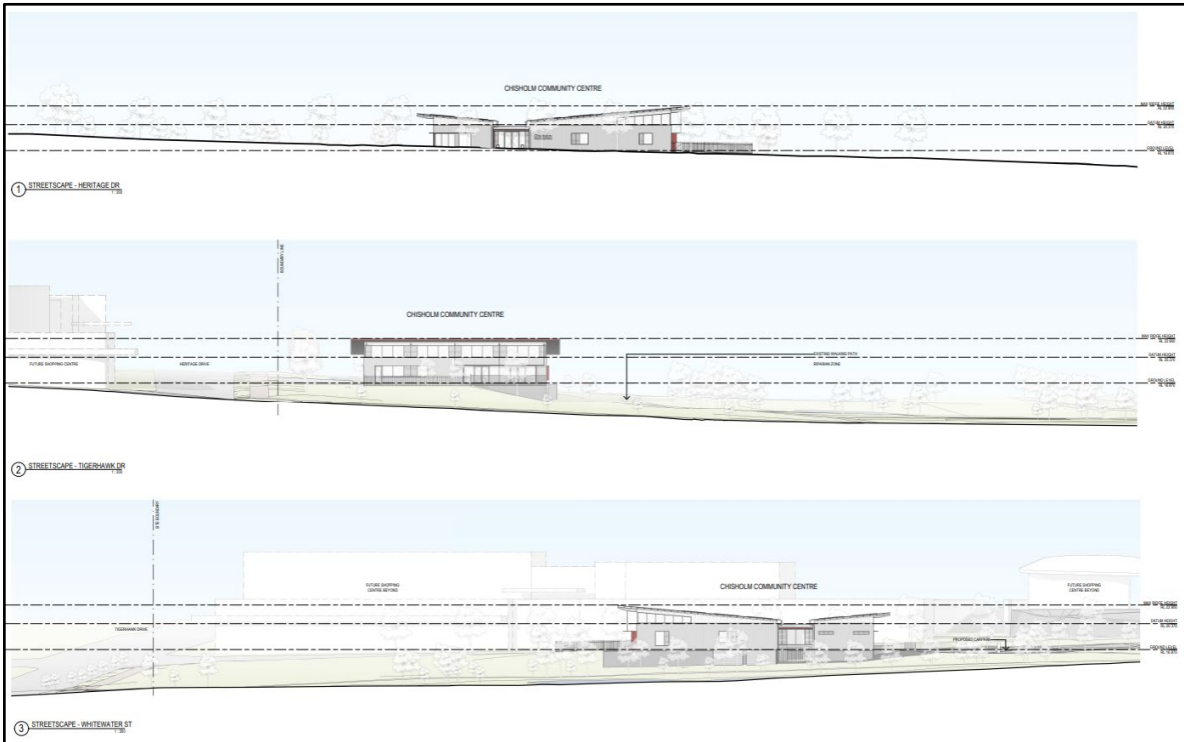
Proposed Streetscape Elevations. Source: AJC Architects dated 23 April 2024
